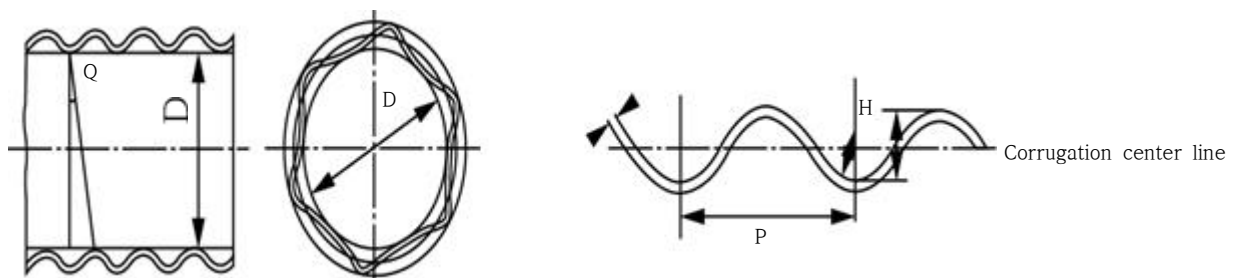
Cross-sectional shape of the resin corrugated steel pipes
